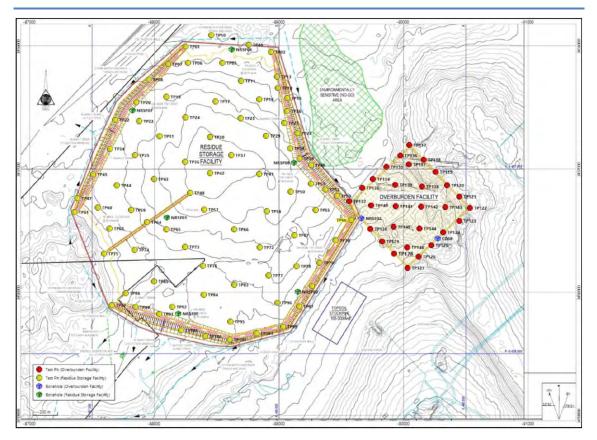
RSF TEST PIT AND CORE DRILL LOCATIONS
